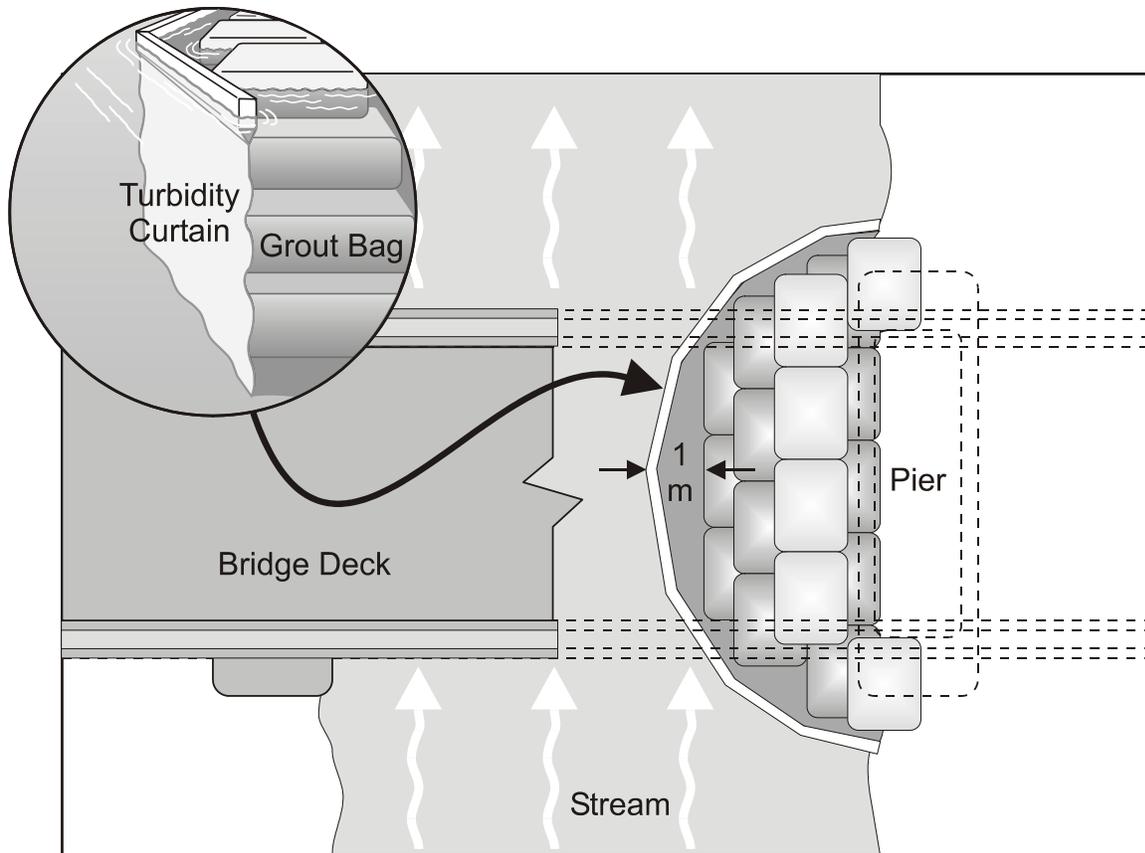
Typical Site Where Grout Bags Were Used in Conjunction with Turbidity Curtain
